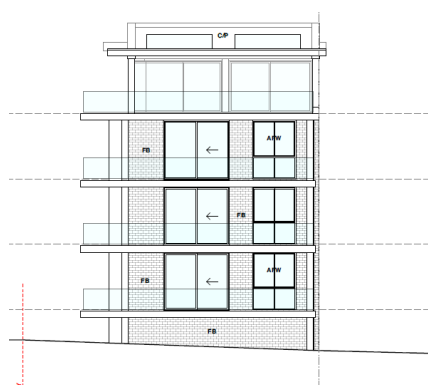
Proposed eastern elevation in PL/39/2021 – 10 Major Street, Coogee (Source: Ken Powell Architect)
